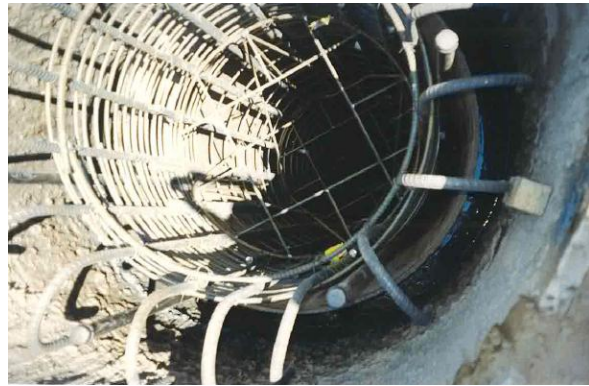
Drilled Shaft Reinforcement (Rebar Cage & CSL Access Tubes)
